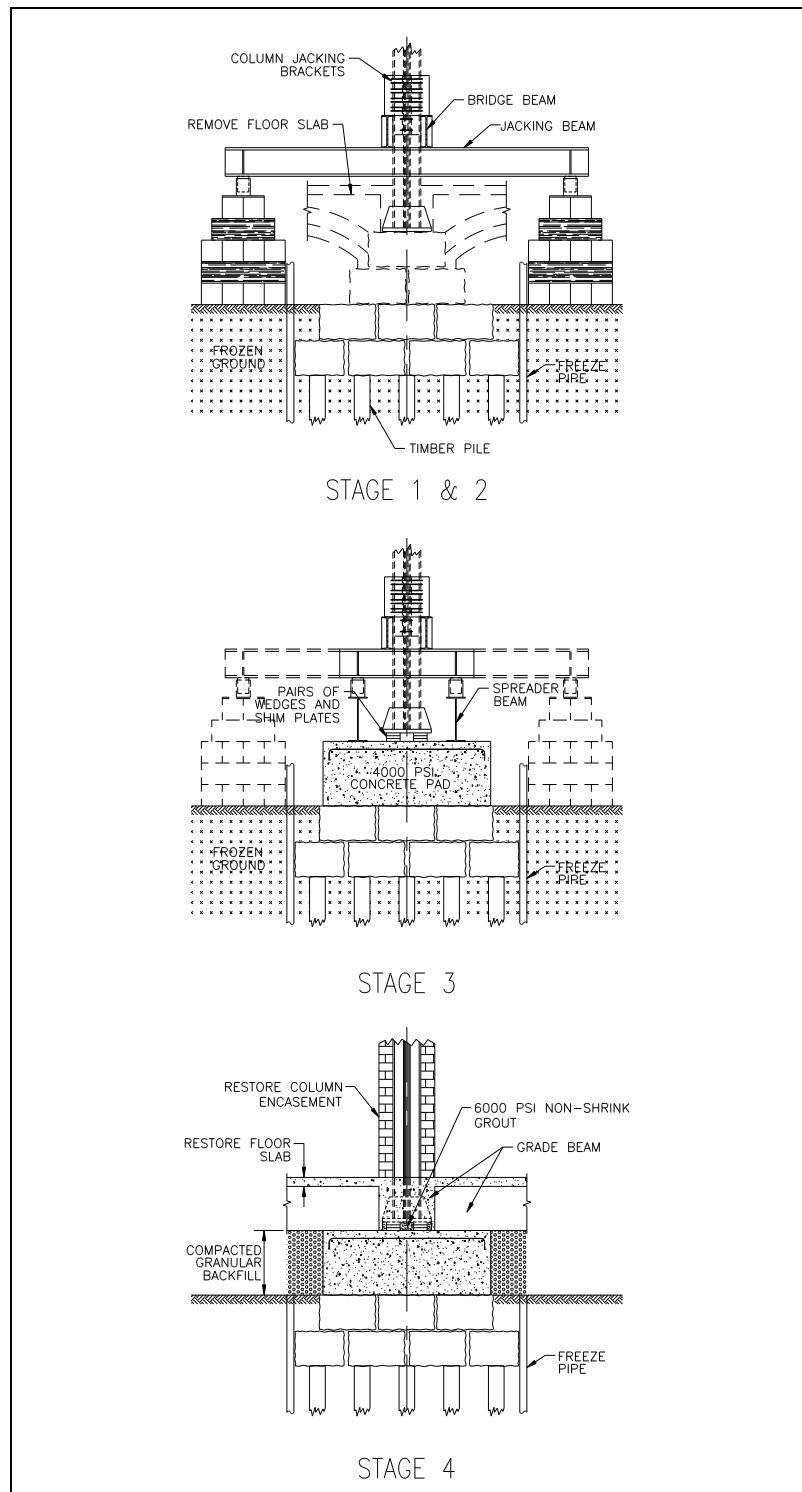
Temporary Jacking System for Building Columns at Graphic Arts Building
